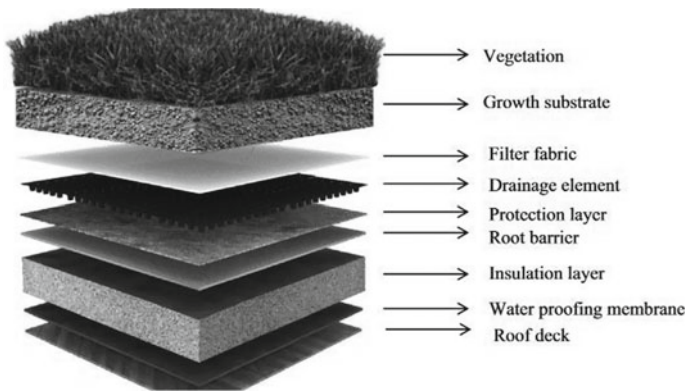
Green roof structure (Modified from: InsulationCorp 2018)
